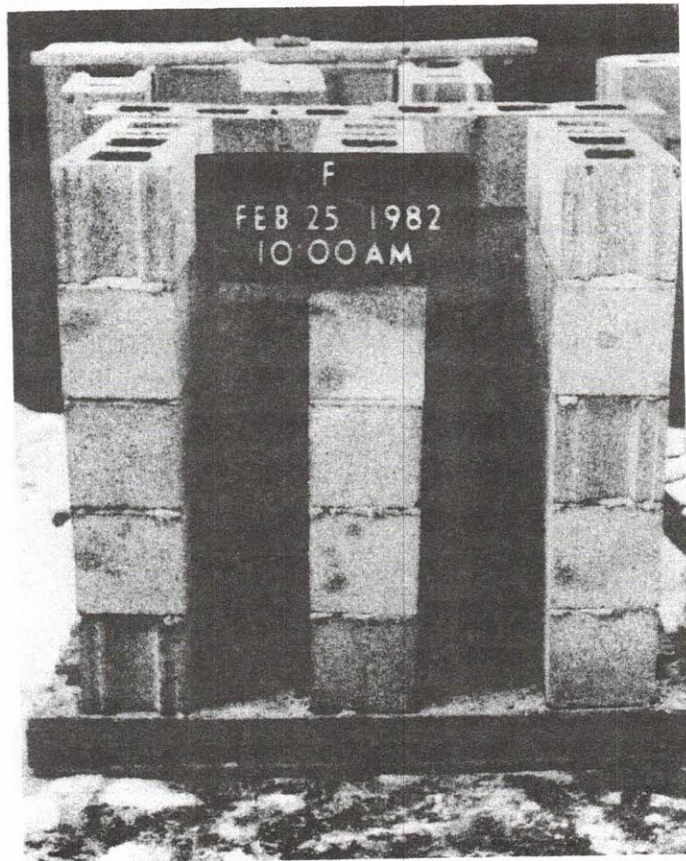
SPECIMEN EXPOSED TO LOW
